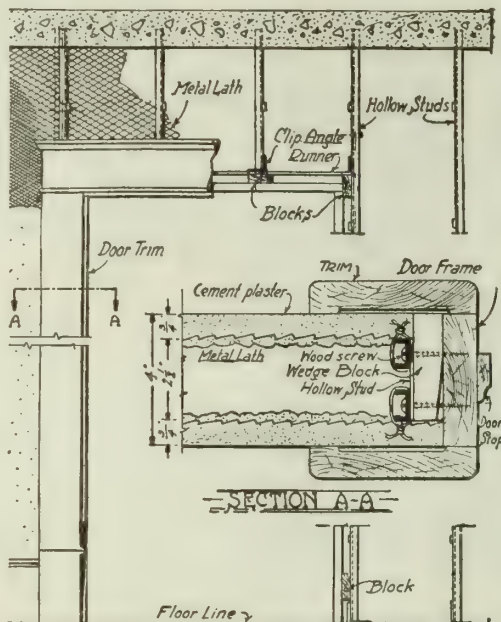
4-INCH HOLLOW PARTITION AND WOOD DOOR FRAME
